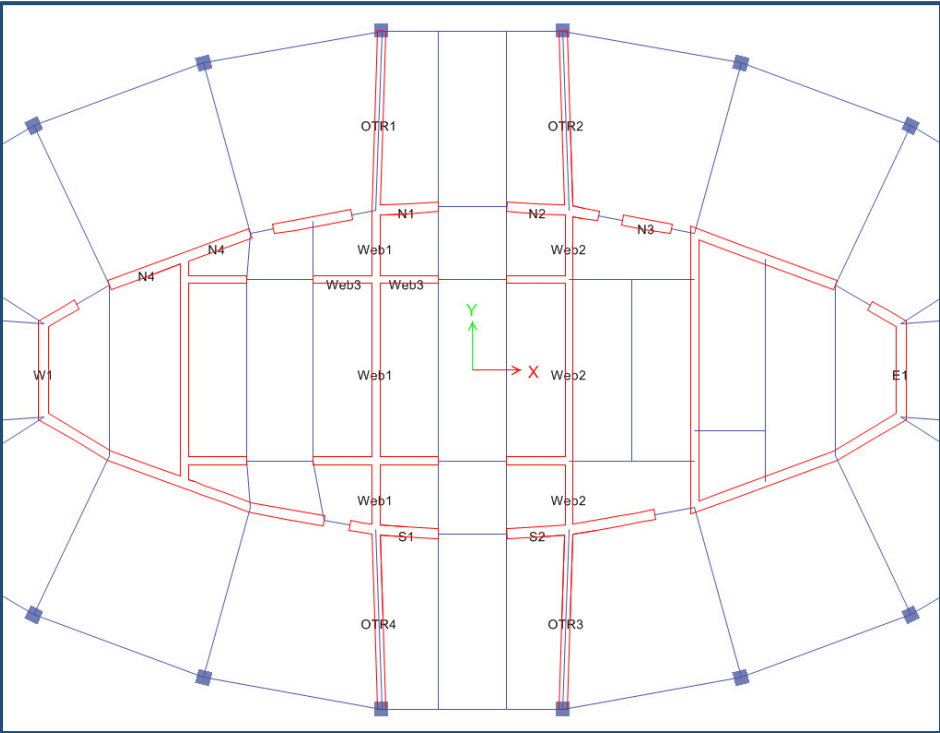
Plan view of Core showing ETABS® Wall Pier and Spandrel Labels
